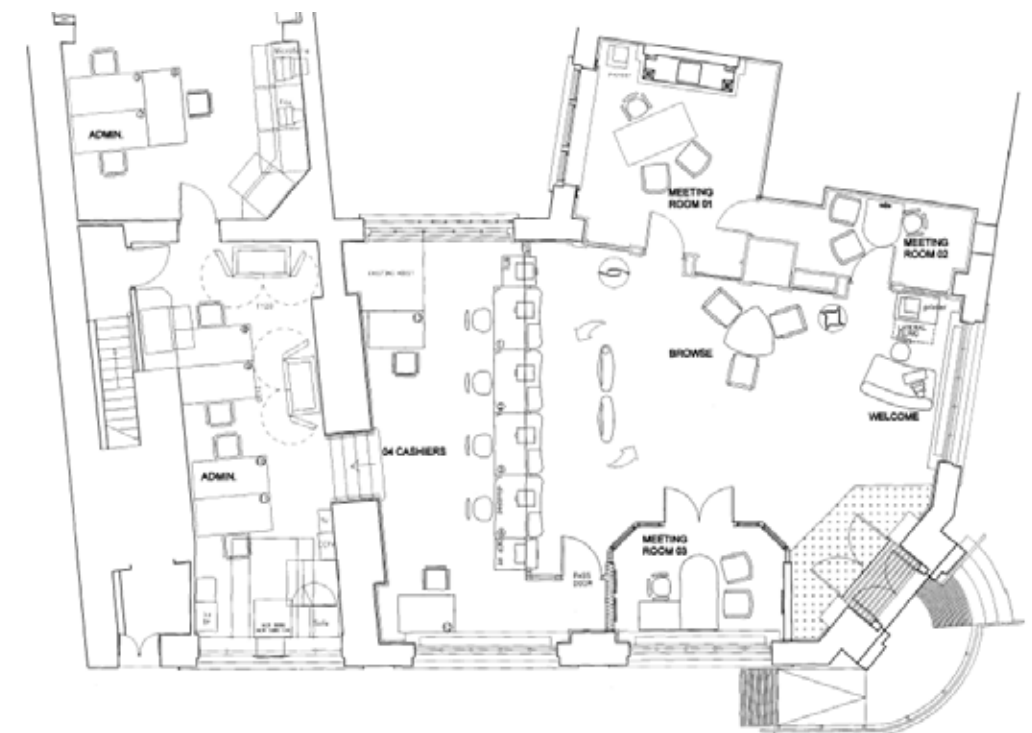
2004 Proposed ground floor plan, Planning Ref. 2004/4314/L
